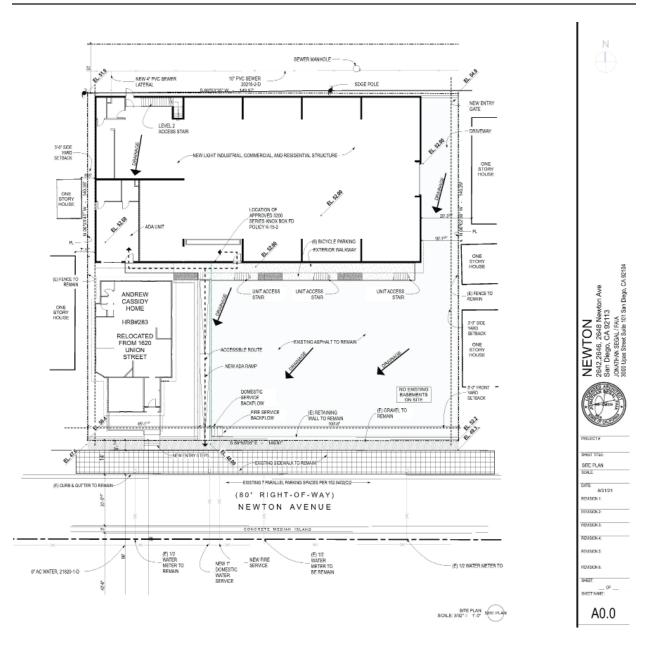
Newton Avenue Proposed Site Plan and future development. Source: Matthew Segal.
